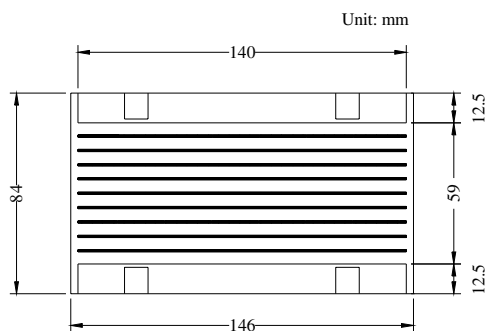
Schematic of Laminated Rubber Bearing (RB)
